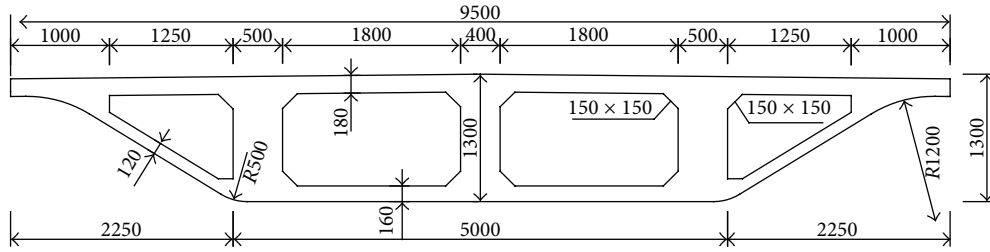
Standard cross section of Dalian northeast road overpass (unit: mm).
